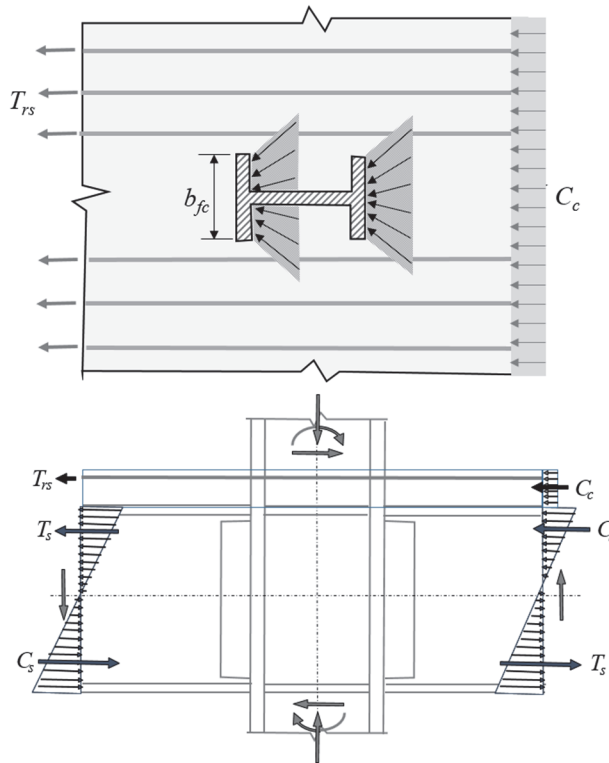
Local transfer of longitudinal stresses resisted by floor slab into the steel column.
